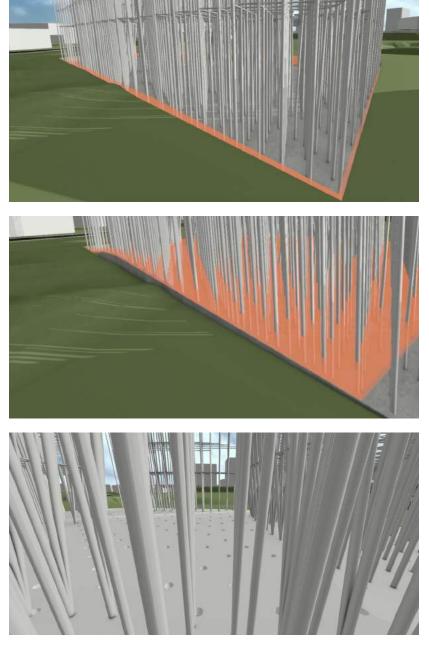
Casting of ground level slab is made around the placed rods and supported by horizontal connections at the level of the slab. Slab leave-outs for the small round skylights are accommodated and later infilled with prefabricated units.
